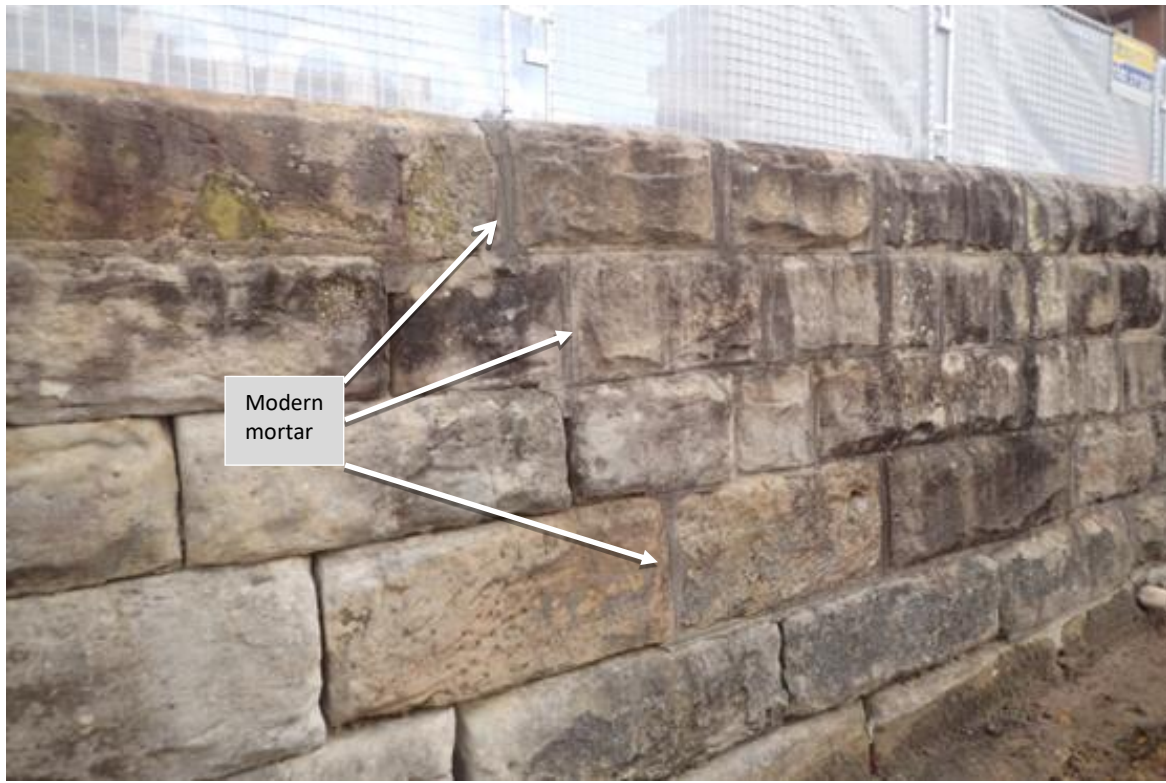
Section of the 1887 wall that was removed and replaced for the installation of a service pipe and drain. The modern mortar used to rebuild the wall highlights the modification.
